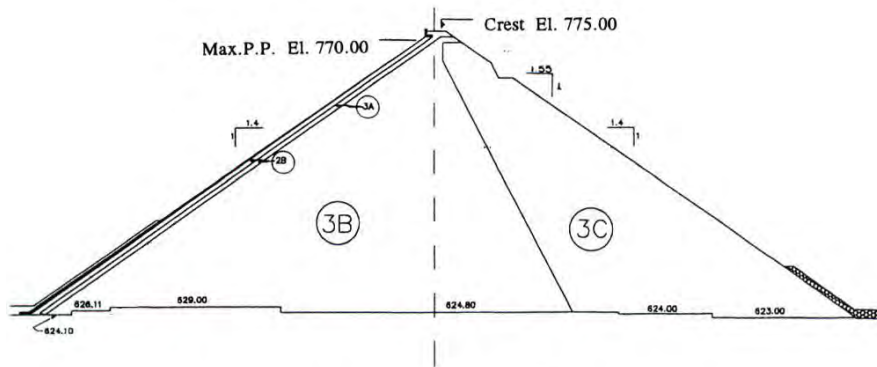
Messochora Dam. Cross Section. 3B, 3C, 3A Rockfill Zones. 2B Transition Zones.
